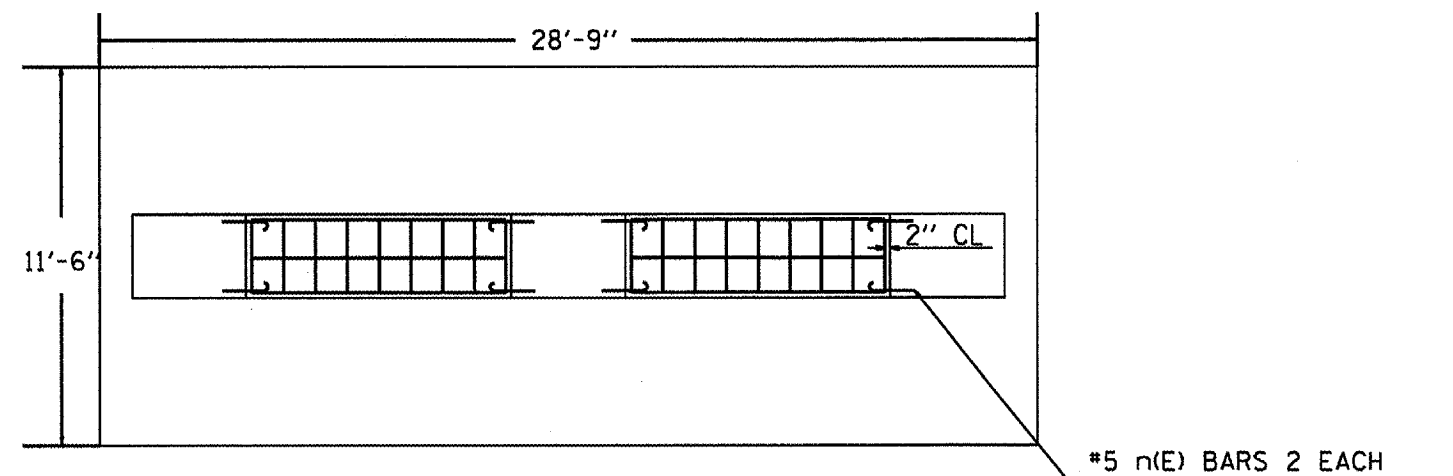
DETAIL OF PIER IMPROVEMENTS AT SN 044-0035
